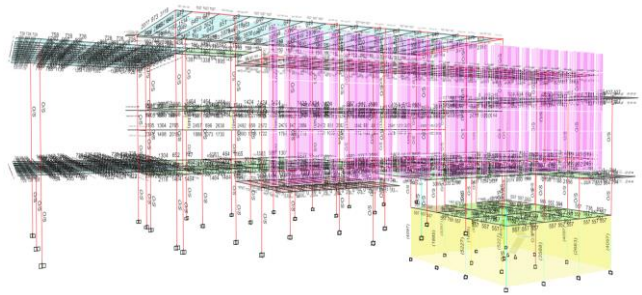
Overstressed columns (shown in red color) of the un-strengthen structure due to vertical and horizontal loads
